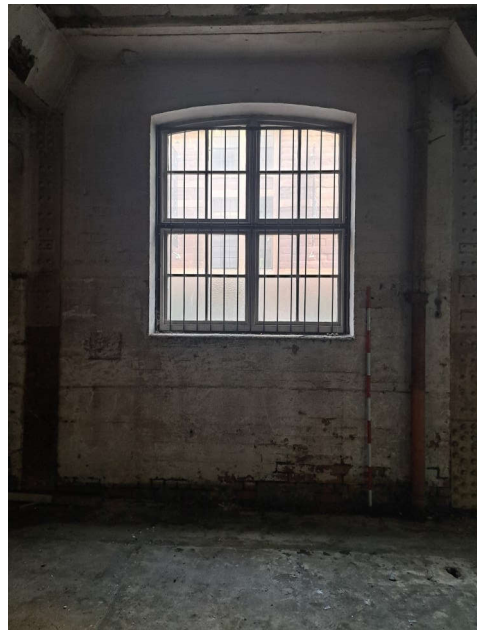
Window in the northern elevation of room FST.4 (Building 2) 1 x 2m scale
